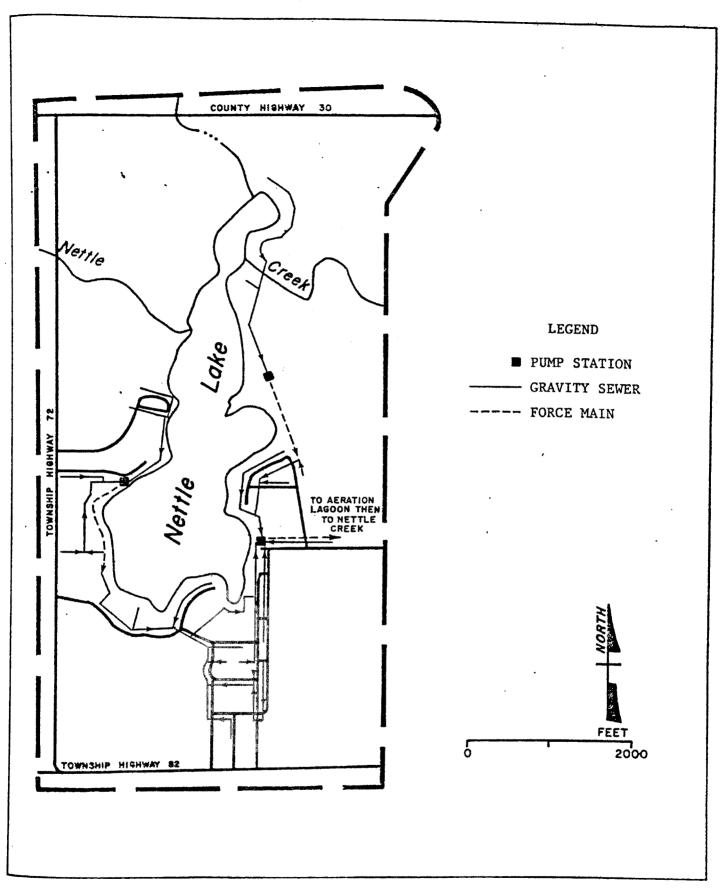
NETTLE LAKE: FACILITIES PLAN PROPOSED ACTION
